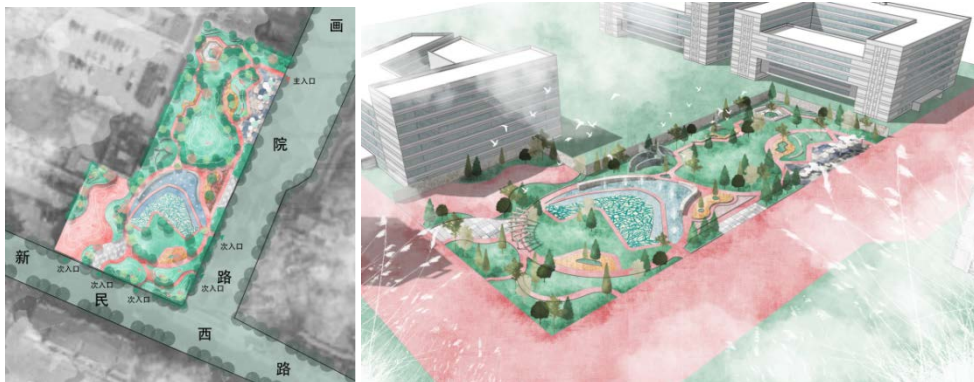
Plan of the Painter's Road Pocket Park and an aerial view of it
